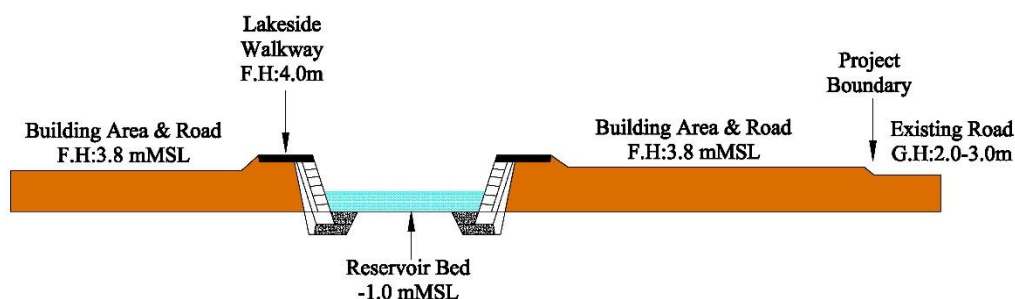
Plan elevation of proposed lake/reservoir location in Sabrang Tourism Park
